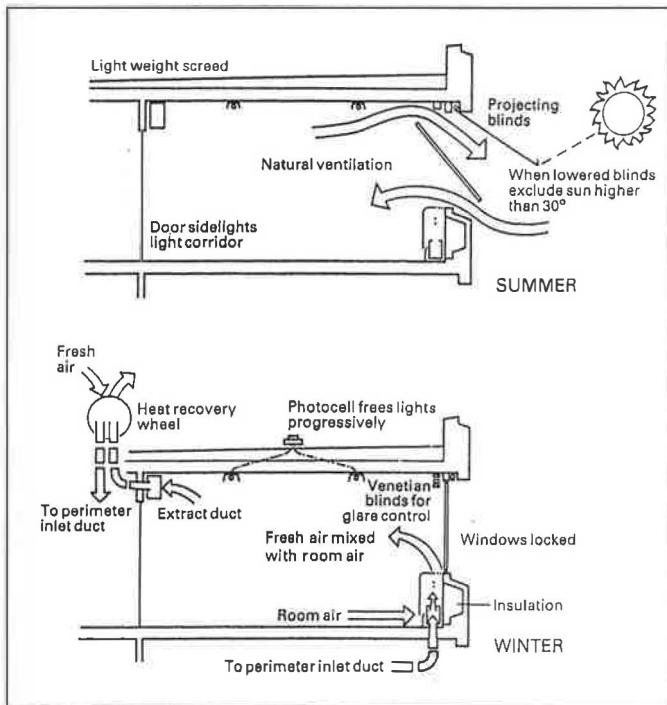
Section through a typical south-facing office showing how comfort conditions are achieved in summer and winter.
